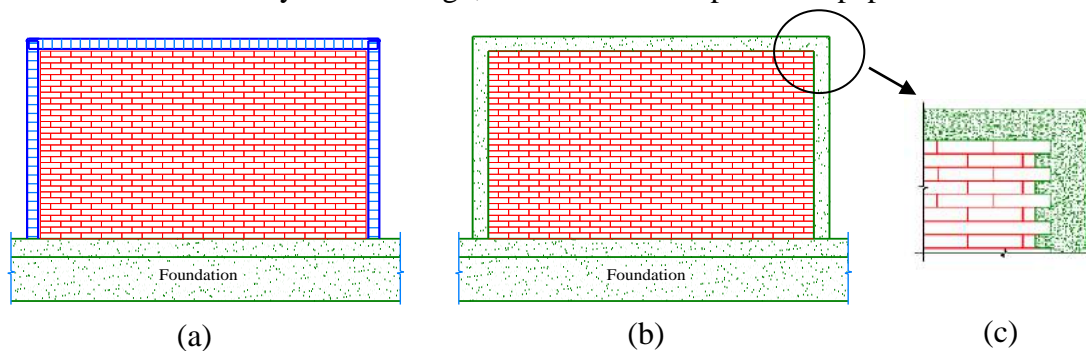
Overview of confined masonry wall construction, including a) positioning of the RC frame reinforcement around the existing masonry wall, b) casting of the concrete frame around the wall, and c) close-up of toothed interface between the masonry wall and RC column.
